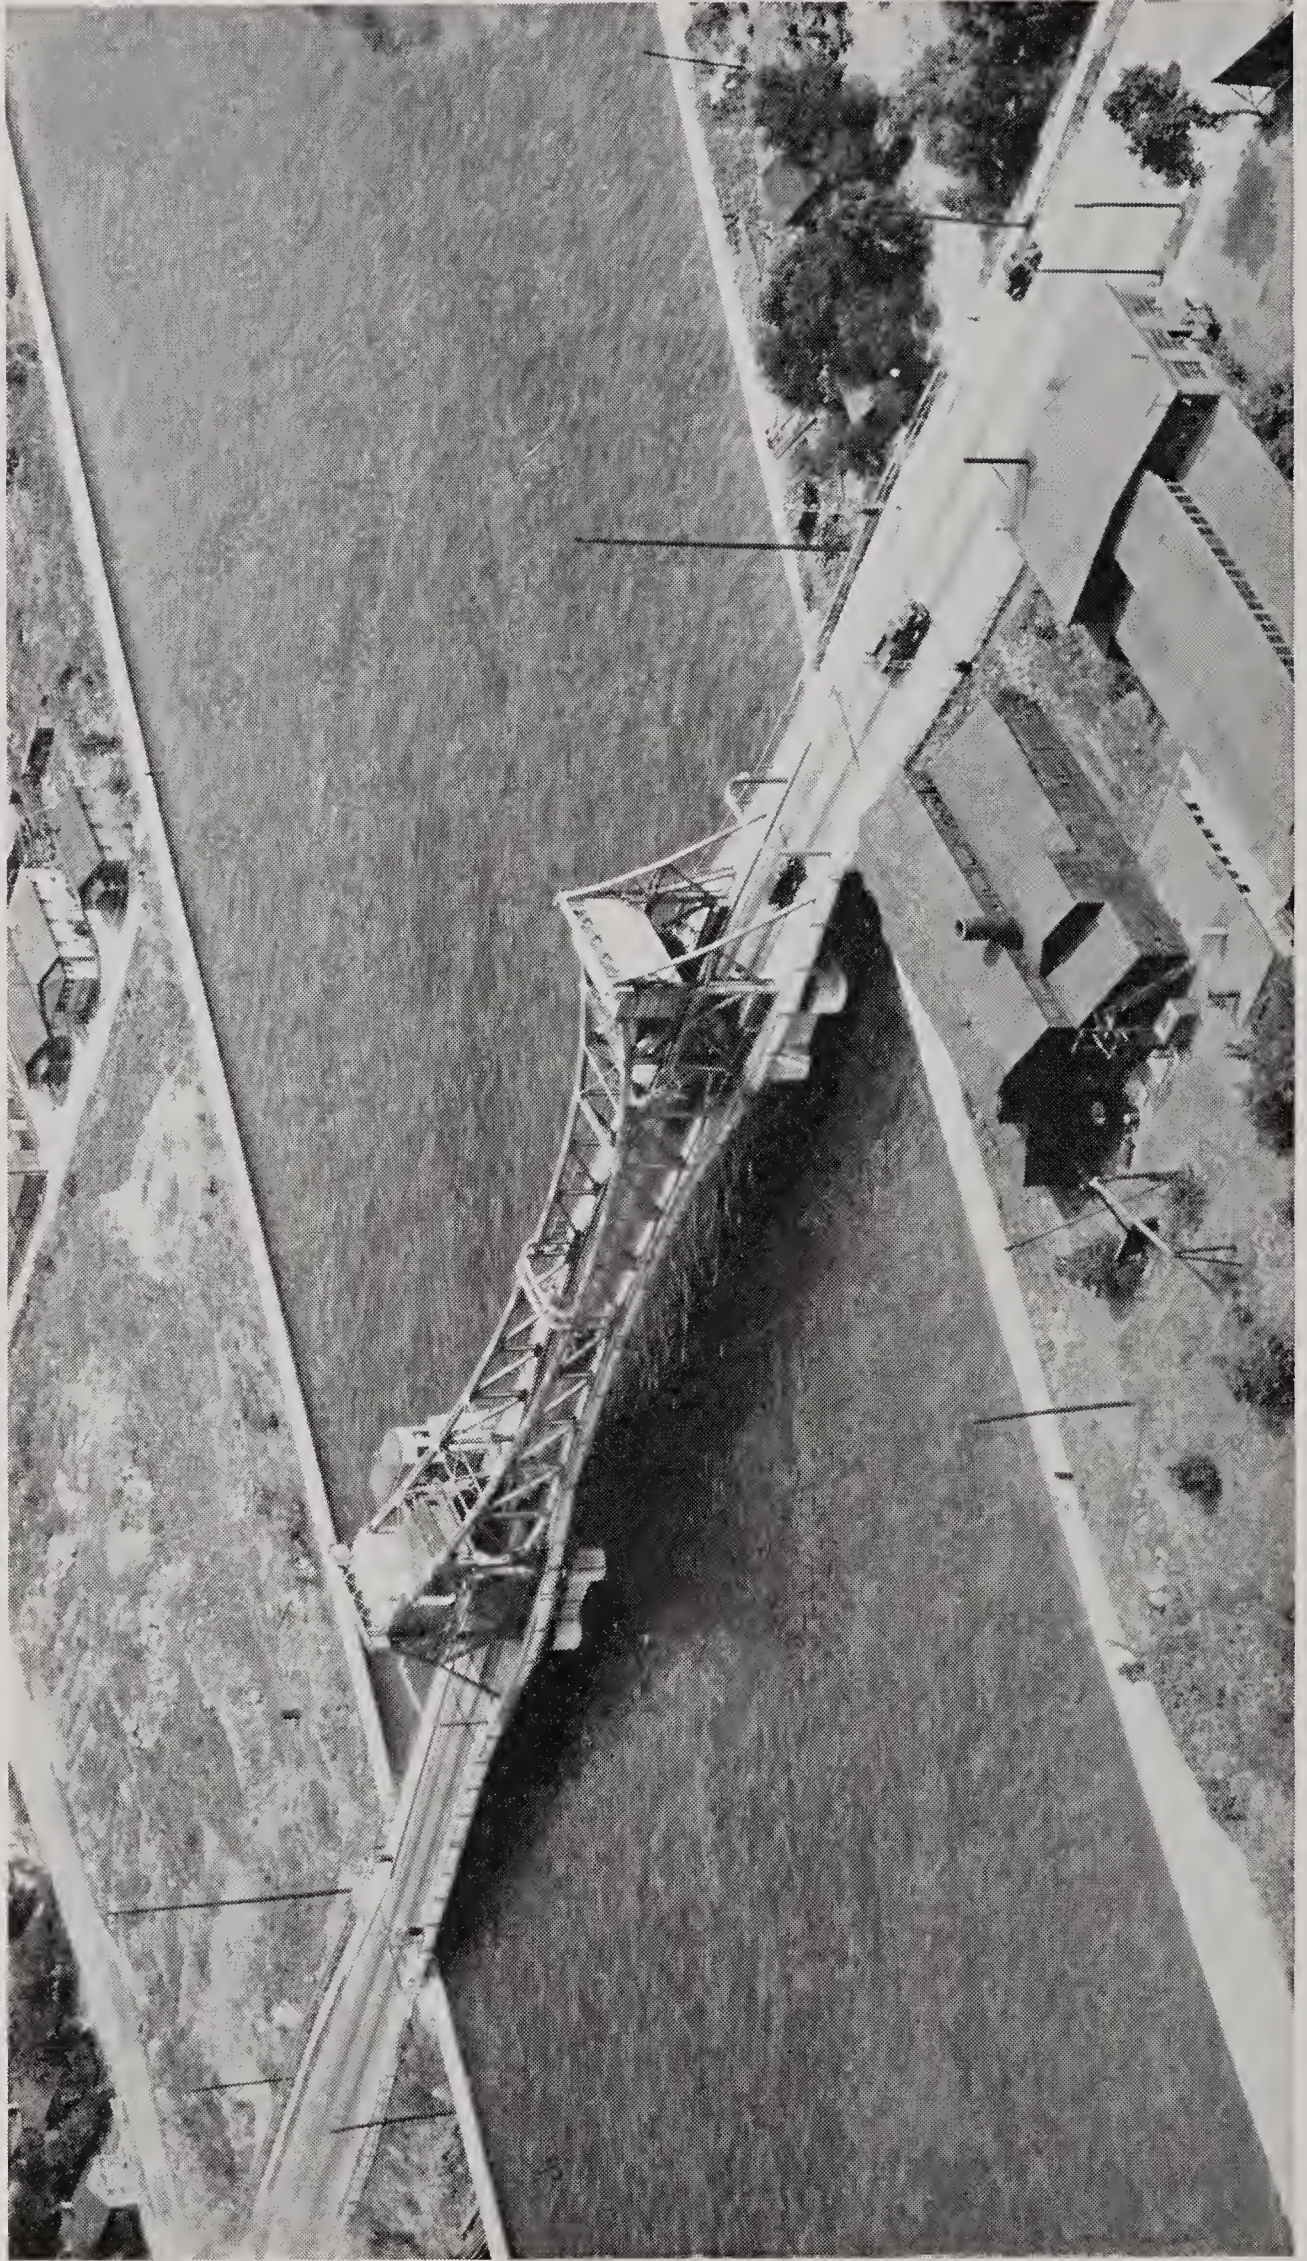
Aerial view of McDonough Street Bridge looking south at Joliet.
